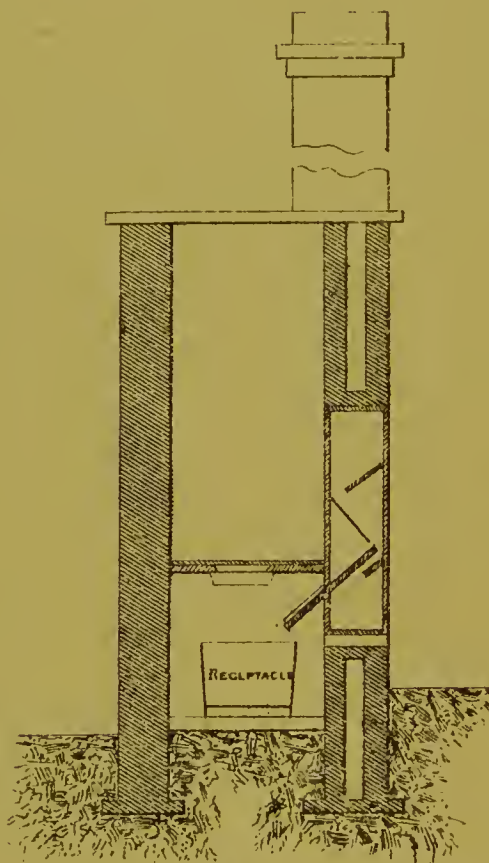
DETAIL DRAWING ATTACHED TO SPECIFICATION OF PRIVIES.
